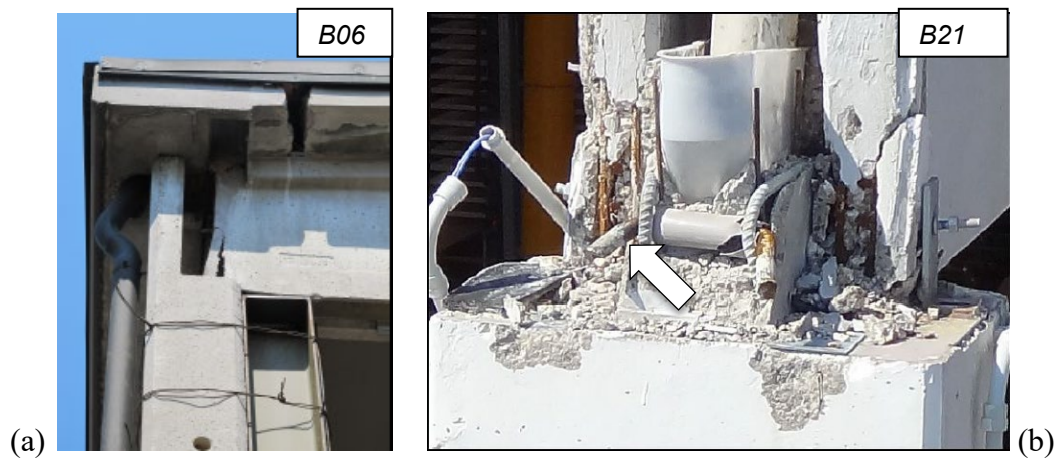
(a) Damage at the extremity of a precast beam where no steel rebars were present in the beam to carry the force transferred by the steel dowel in the beam - column connection; (b) the steel dowel completely bent because unable to carry the horizontal force at the beam – column connection.
